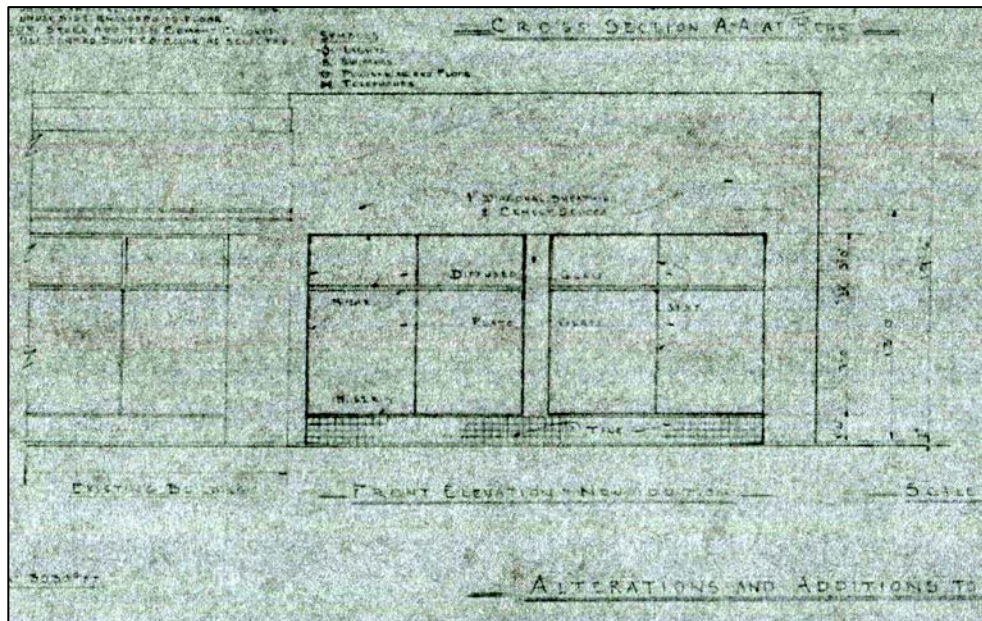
Detail of 1957 addition's front elevation, taken from original drawings. Note the paired display window with a tile spandrel beneath. The 2004 storefront remodeling campaign removed all of the 1957 fenestration and detailing (Courtesy: Santa Cruz Planning Department, 504 Front Street).
